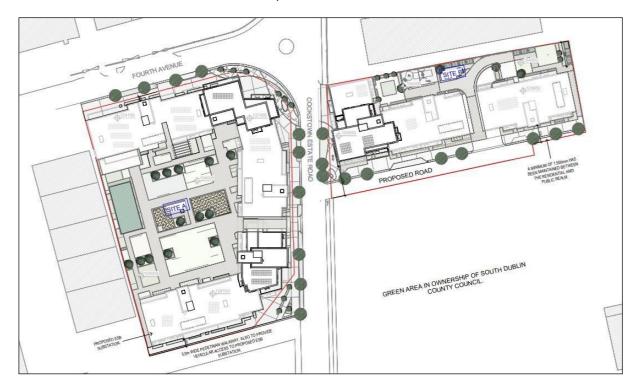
Proposed Site Plan proposed under Section 247 Meeting Ref. No. SHD1SPP012/18
